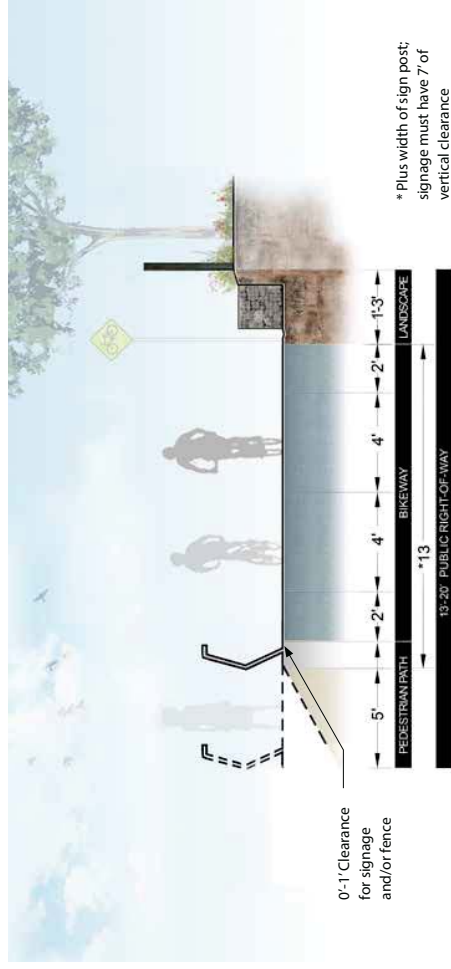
Wilbur Avenue to Yolanda Avenue - Typical Cross Section
